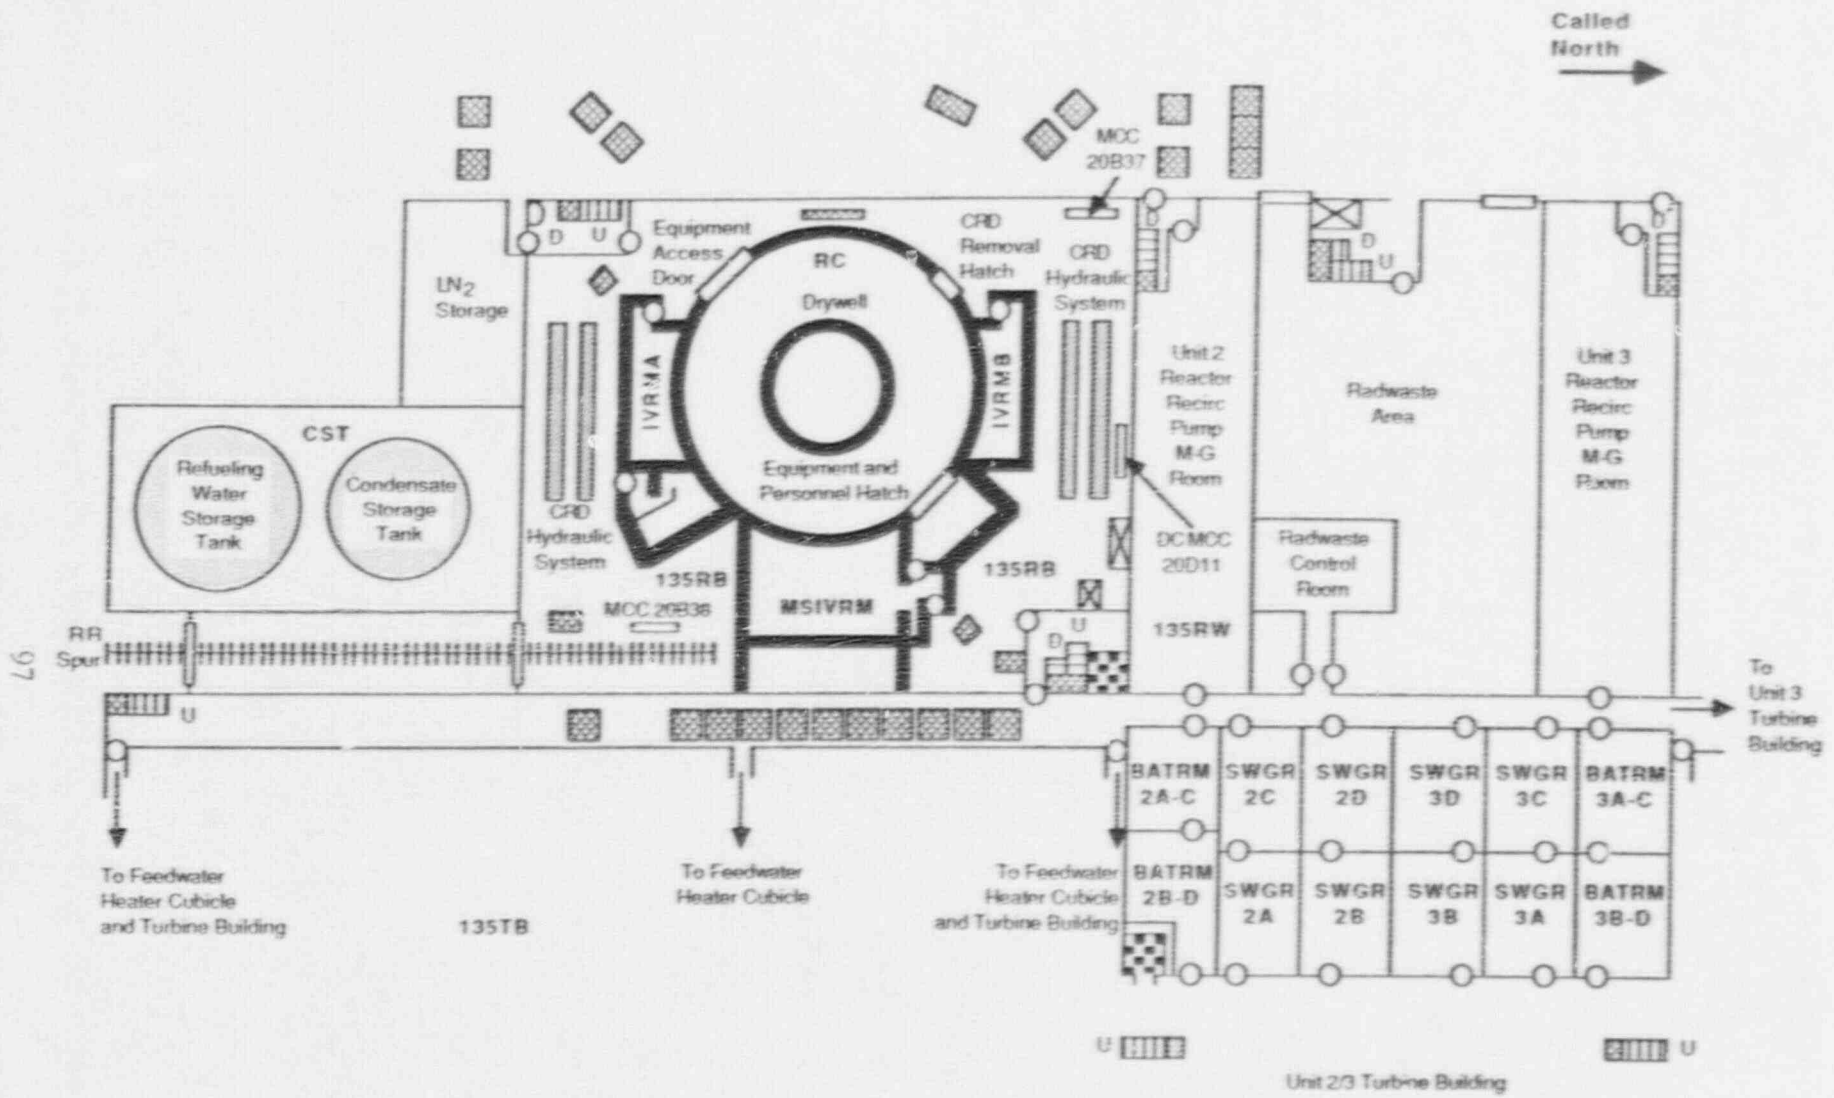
Peach Bottom 2 Reactor and Radwaste Building and Unit 2/3 Switchgear Rooms, Elevation 135'0"
